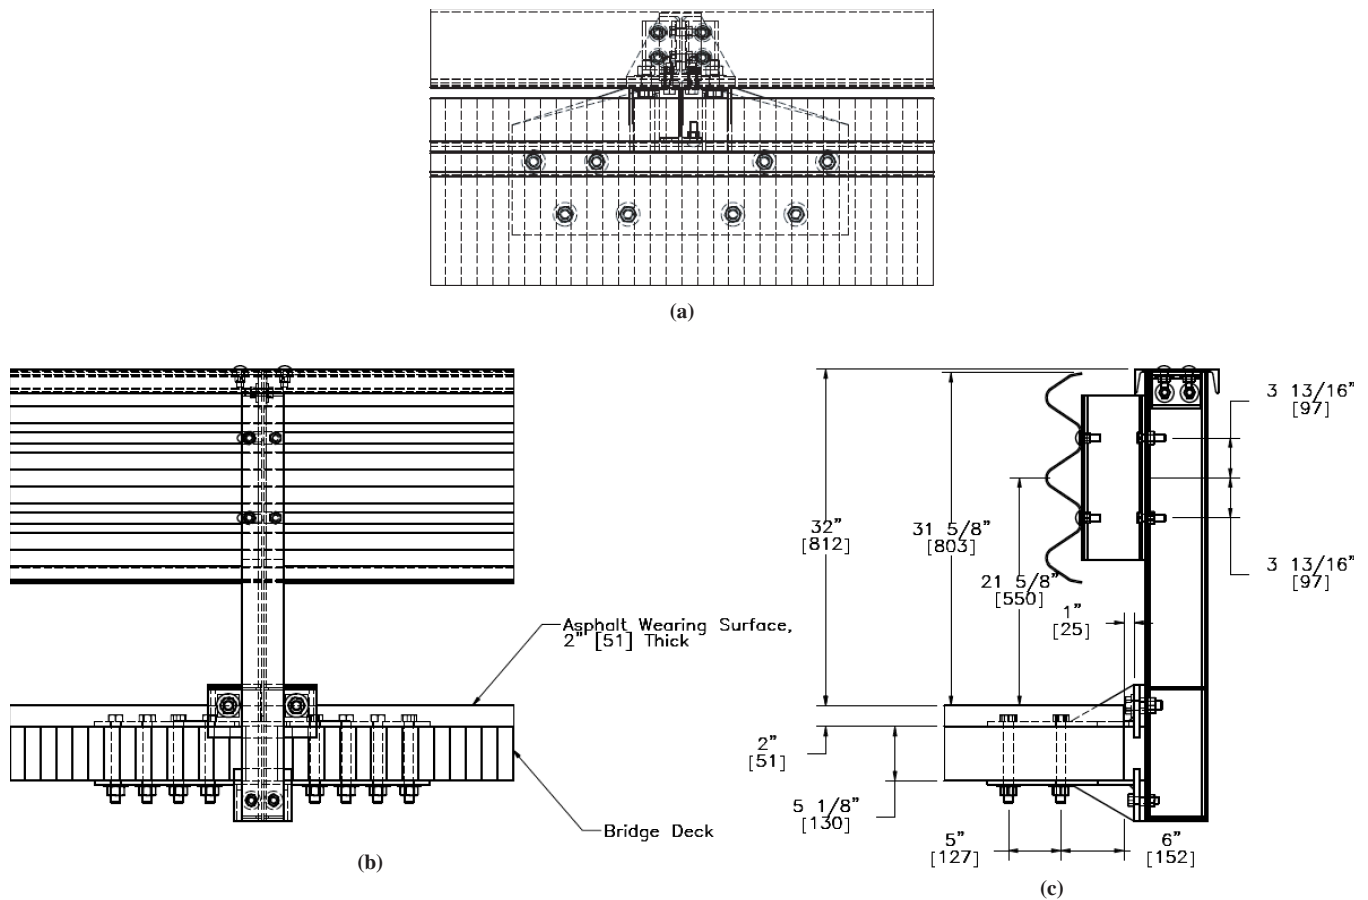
Views of post connection to transverse nail-laminated bridge deck for TL-2 rail: (a) plan, (b) elevation, and (c) profile.
